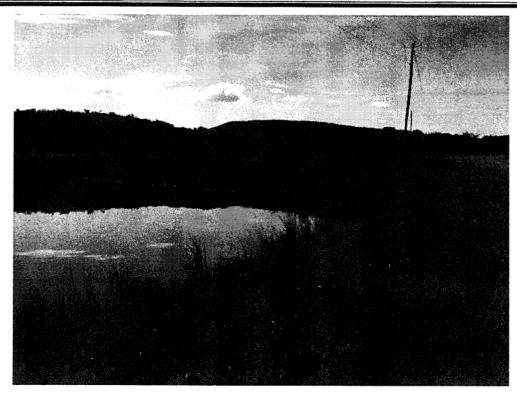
Downstream Pipe Outlet into Pond No. 1
